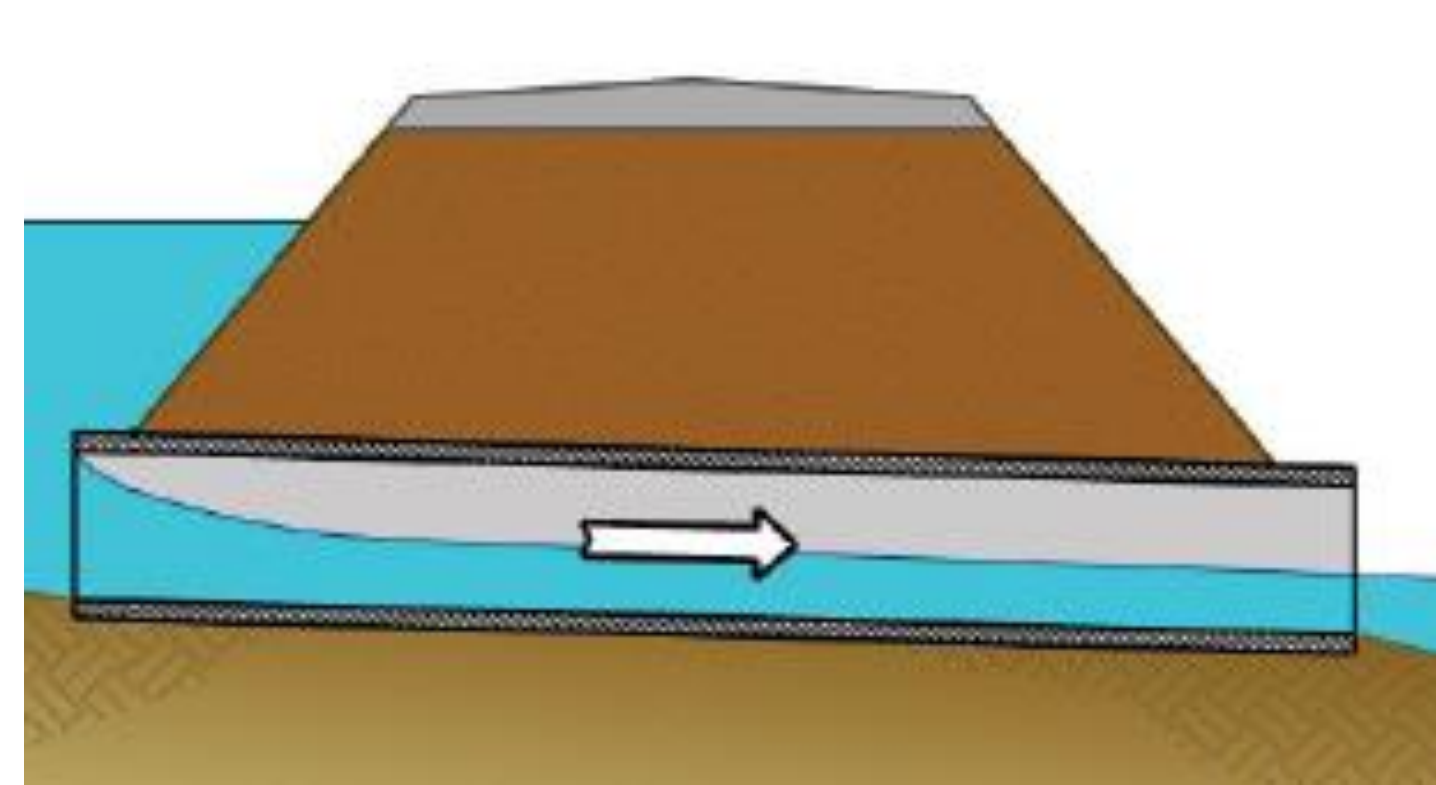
A Unsubmerged inlet (Hydraulic Design of Highway Culverts)
